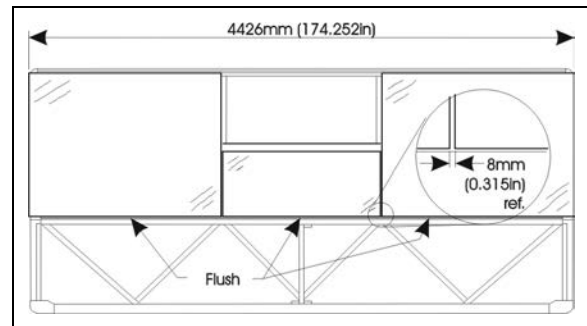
FACE FIXED WINDOW INSTALLATION
